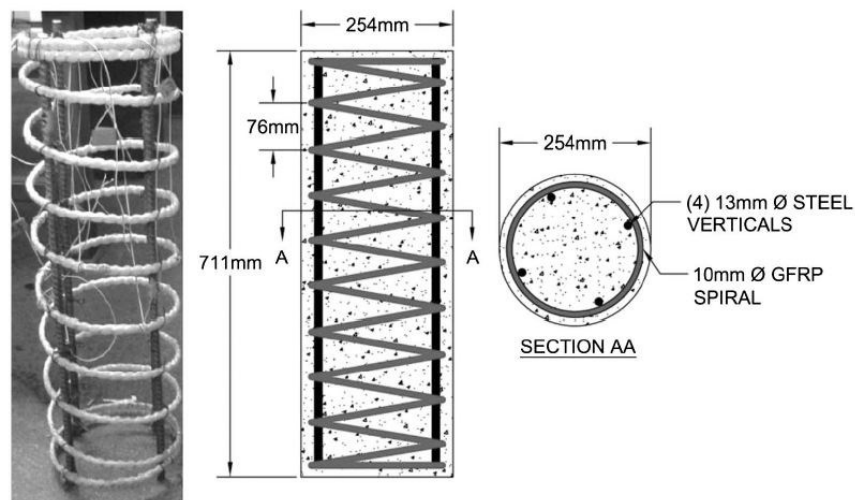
Specimen details of hybrid-reinforced column (Pantelides et al. 2013)
